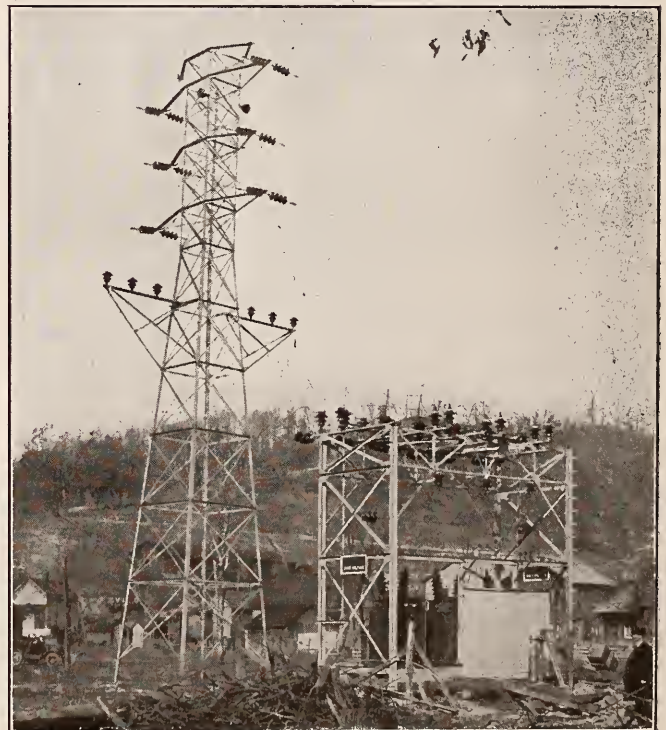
Galvanized Steel Substation and Line Tower Adjacent
